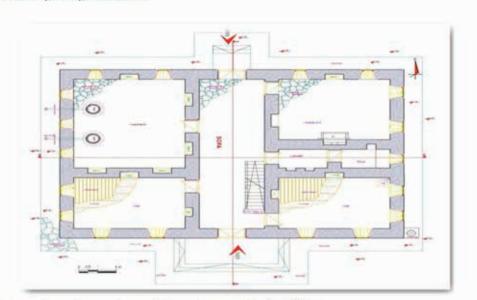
Hüsrev Paşa House Ground Floor Layout (Ş. ÖZTÜRK)
